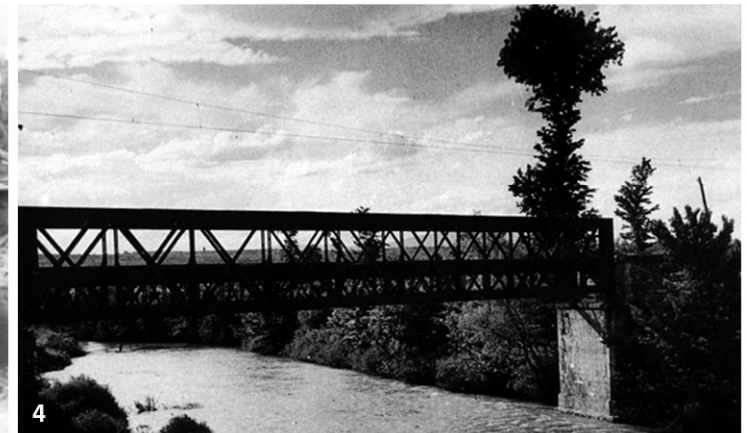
Viaduct of Castañares (1). Sancho el Sabio Foundation
